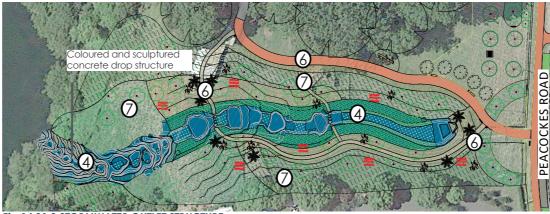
STORMWATER OUTLET STRUCTURE
